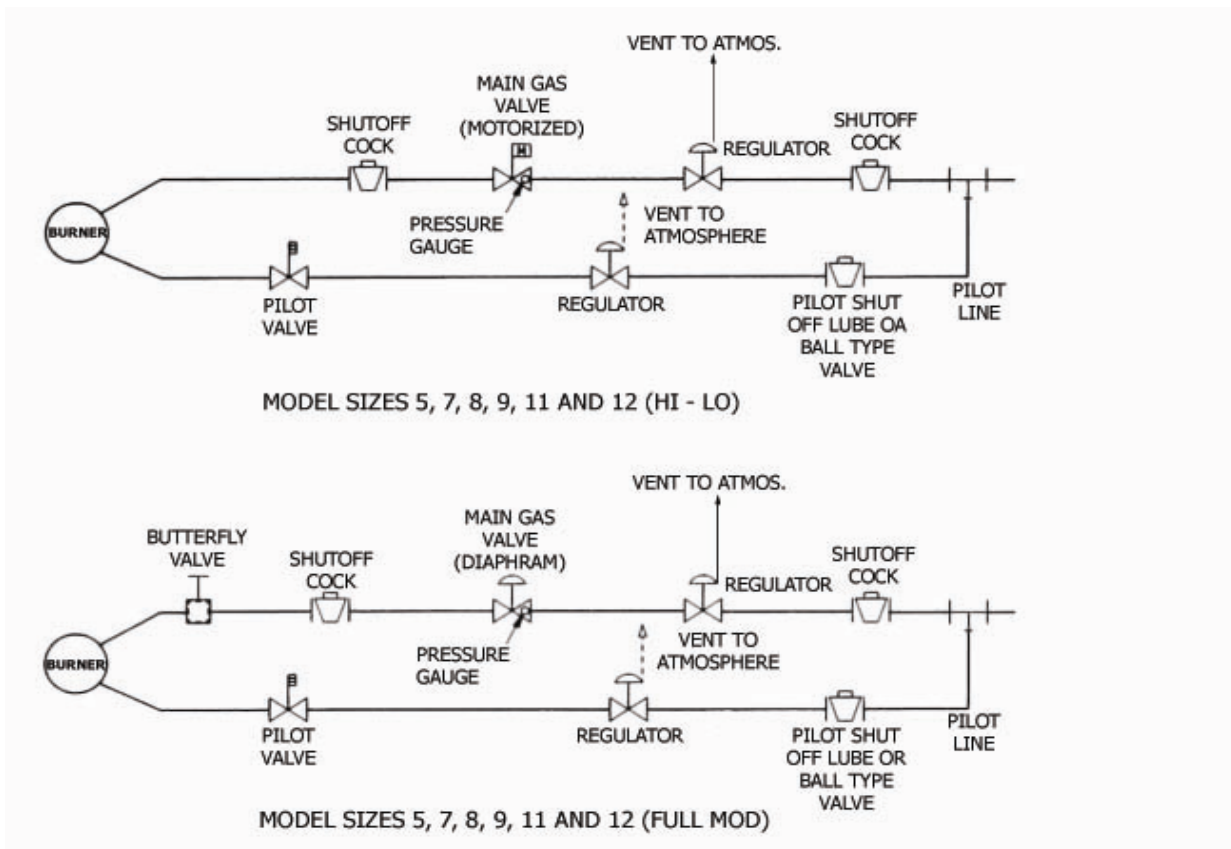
Gas Piping, Typical U.L. Arrangement FP5-12
